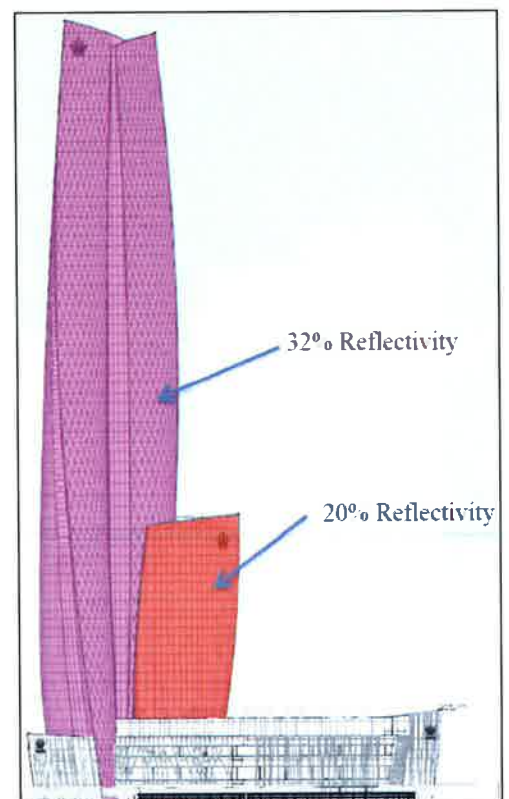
Façade reflectivity (Source: Applicant's EIS)
